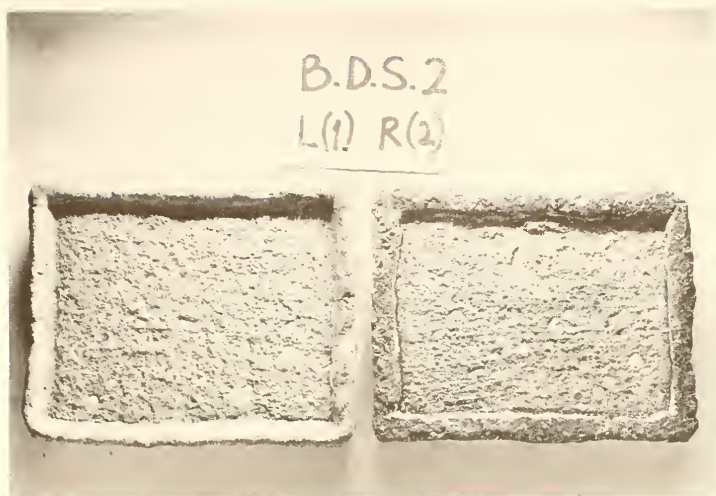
Appearance of Surface of Non-Air Entrained BD Concrete After Scaling Test
